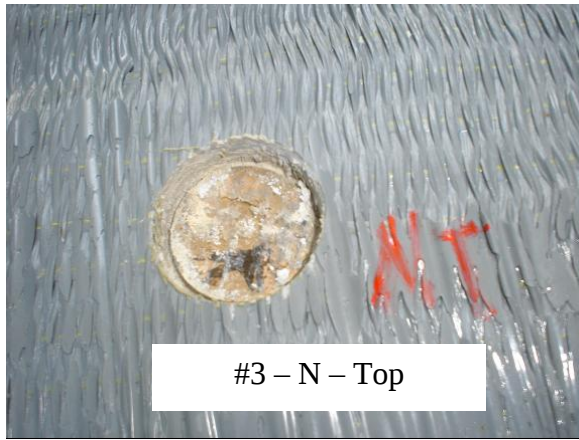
Bond Test on Pile3 (all epoxy failure)
